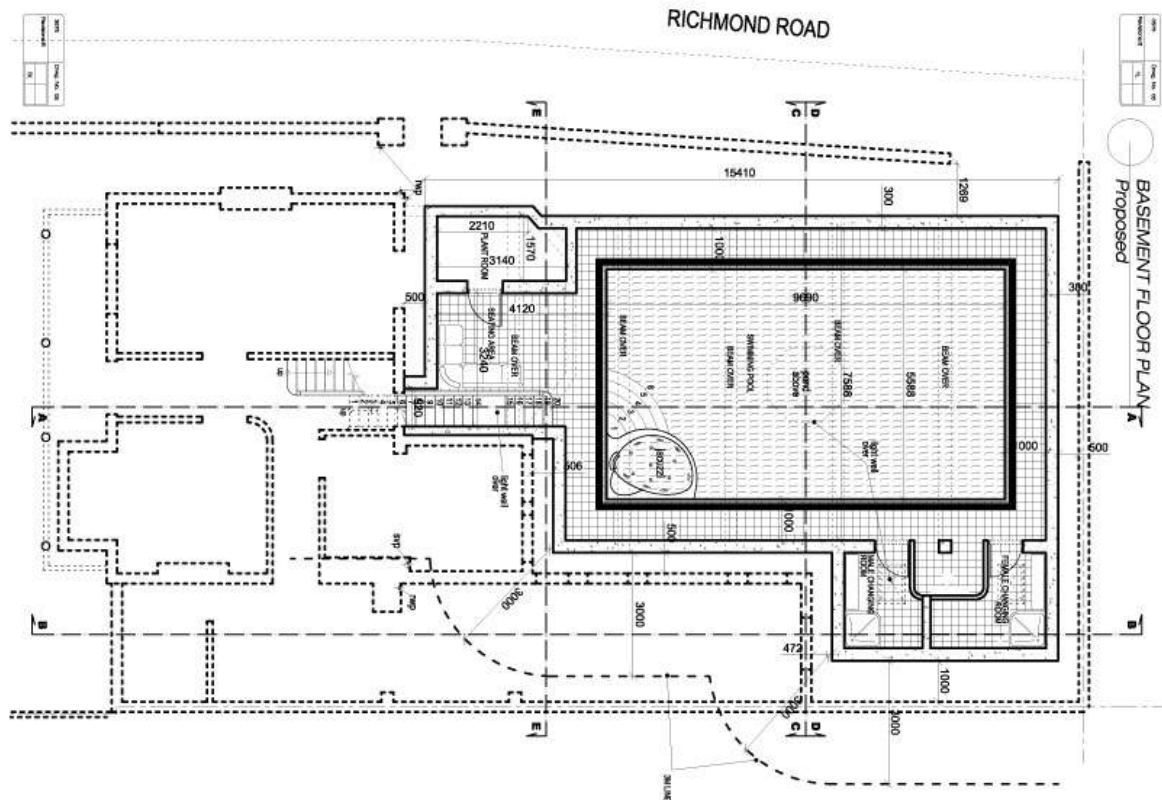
Proposed plan of the underground swimming pool. (Blanchard Consulting Ltd).
